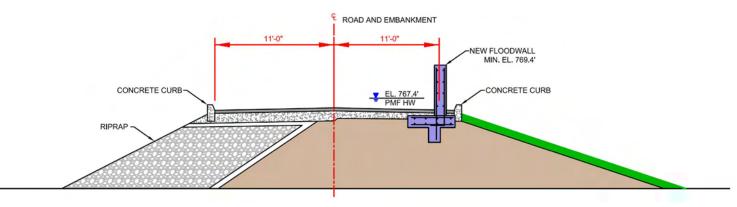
Watts Bar Dam - Concrete Floodwall Concept for Segments WB-1 through WB-4
